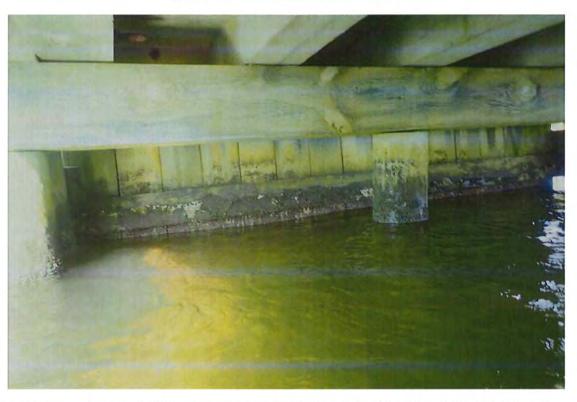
General view of west abutment bent & bulkhead, mildew staining & marine growth throughout.
